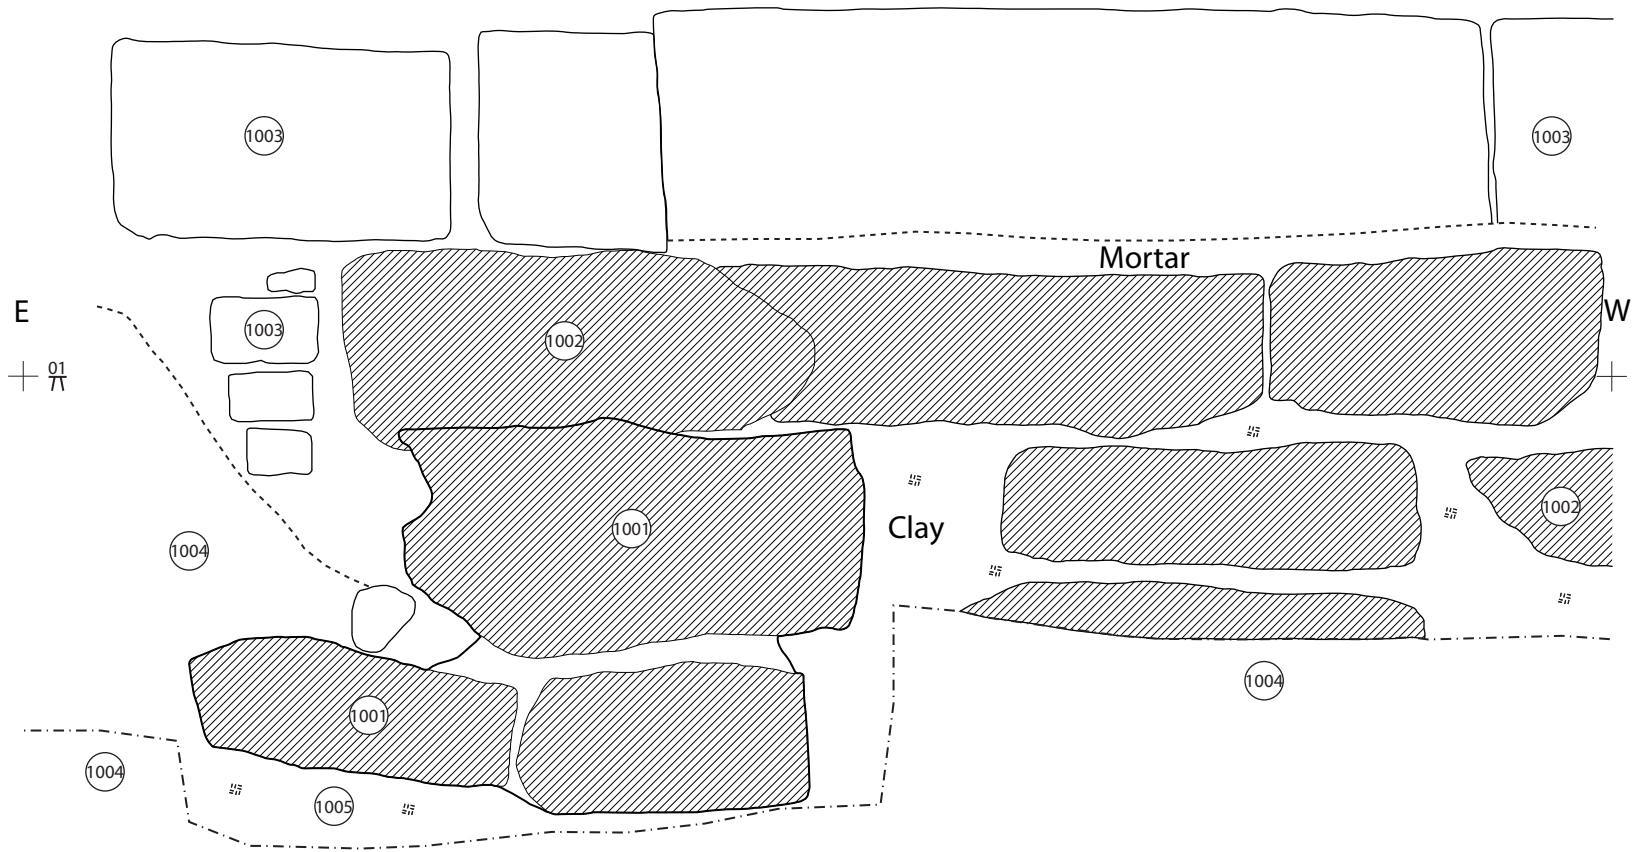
Plan of St Alban's Church medieval foundations (located on figure 02).
